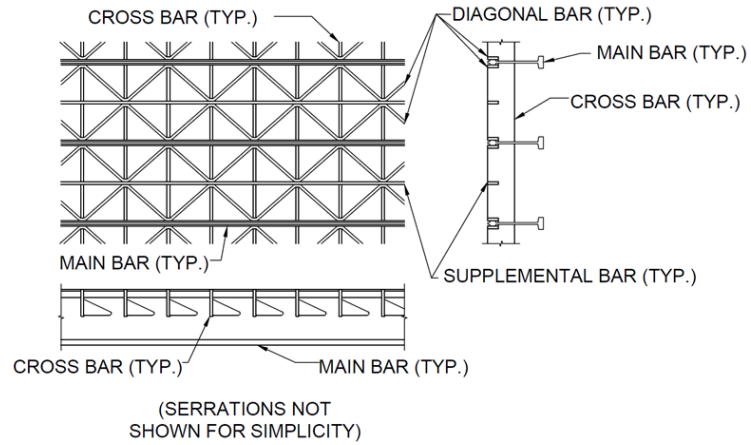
Welded open grid deck components (diagonal bar shown) (original detail provided by the BGFMA)
